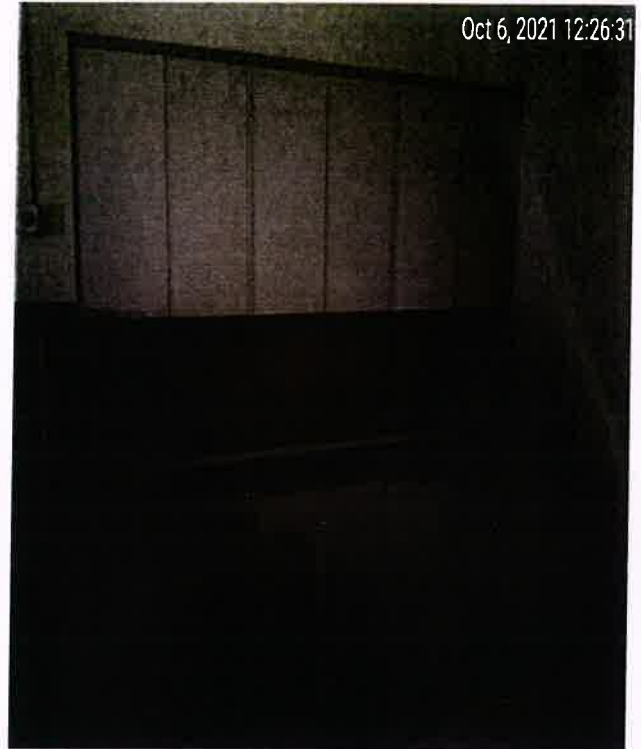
INTERNAL PHOTO OF THE LOFT
